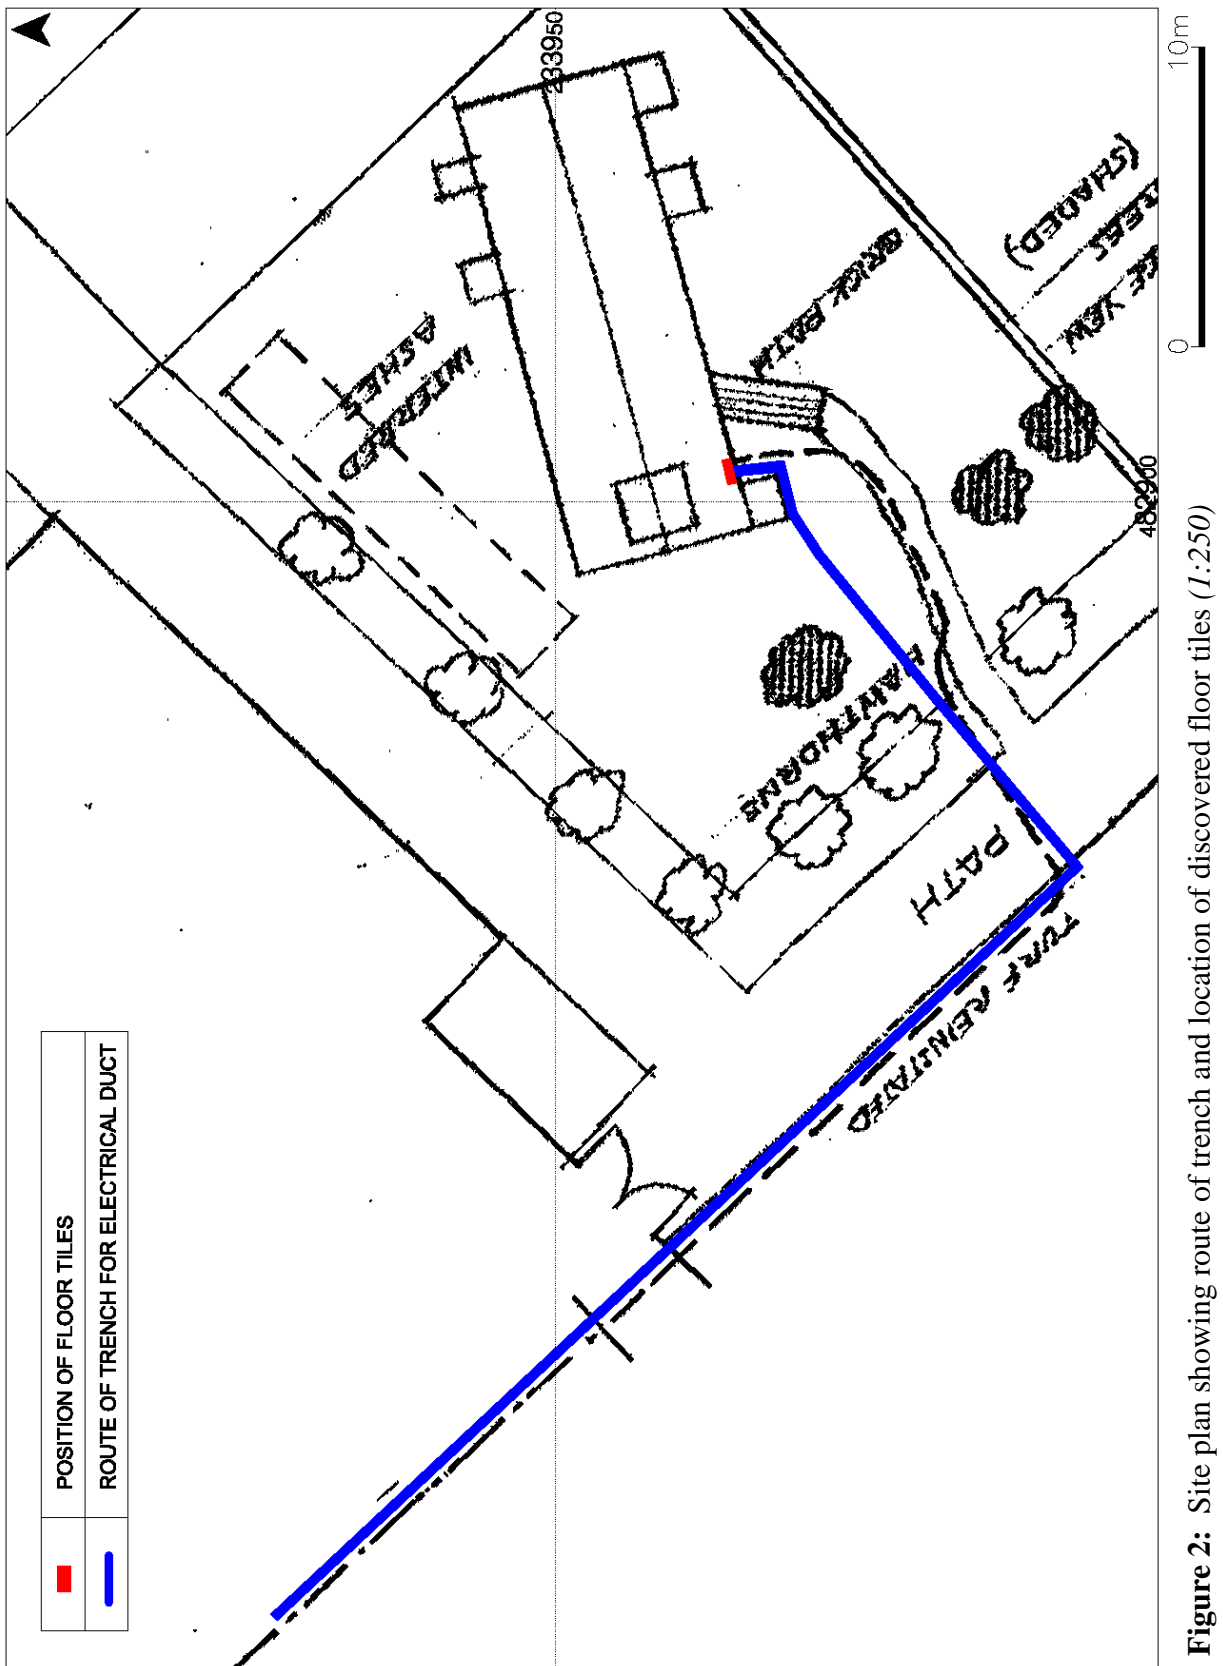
Site plan showing route of trench and location of discovered floor tiles (1:250)
